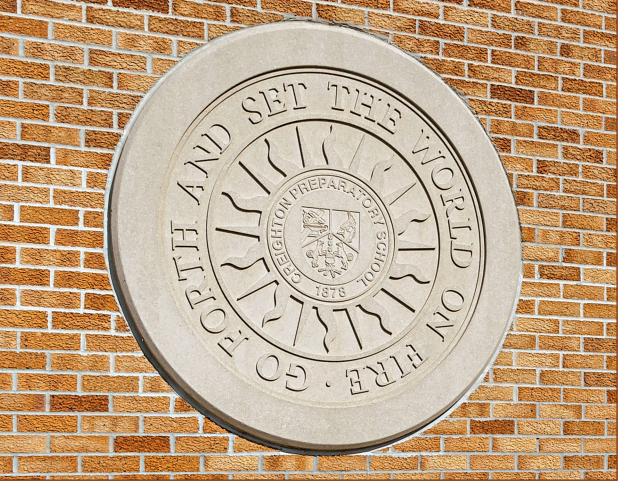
Example of a project with precast concrete medallions, which would be best produced by precasters with category AT certification from the Precast/Prestressed Concrete Institute Architectural Certification Program. Photo courtesy of Jacia Phillips | Arch Photo KC and Enterprise Precast Concrete.
